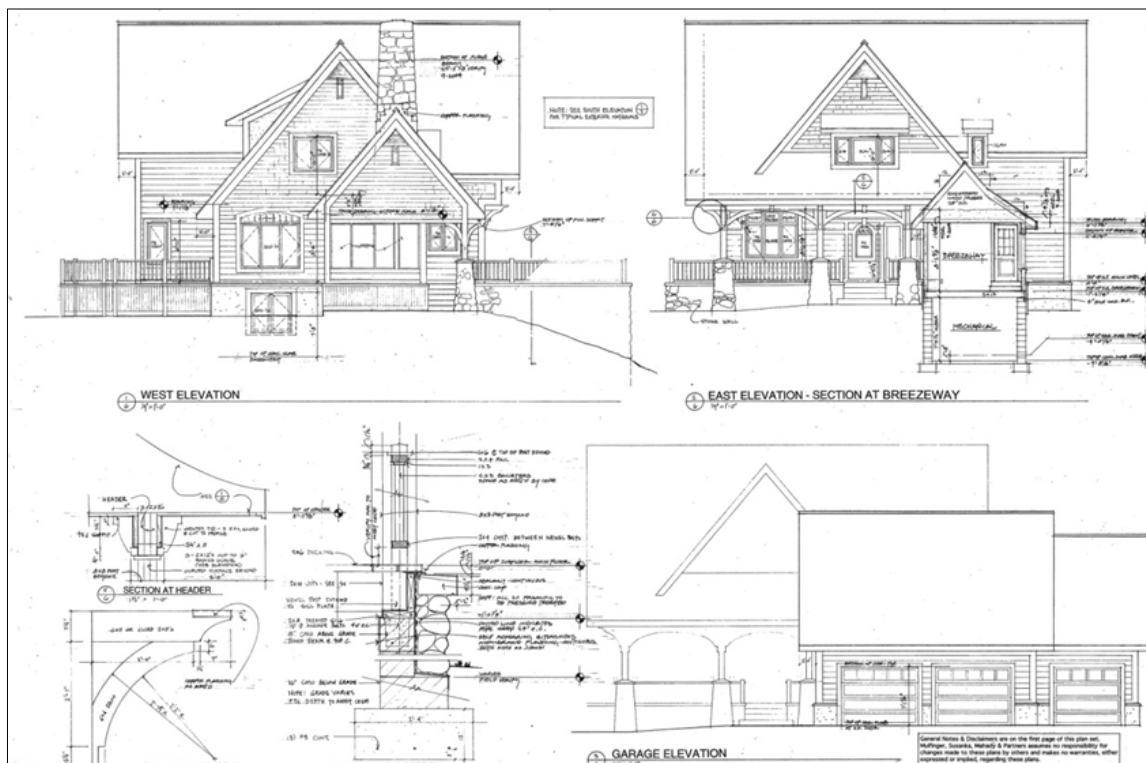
AutoCAD drawing of the elevation of a house (HandtoCAD, 2008)
